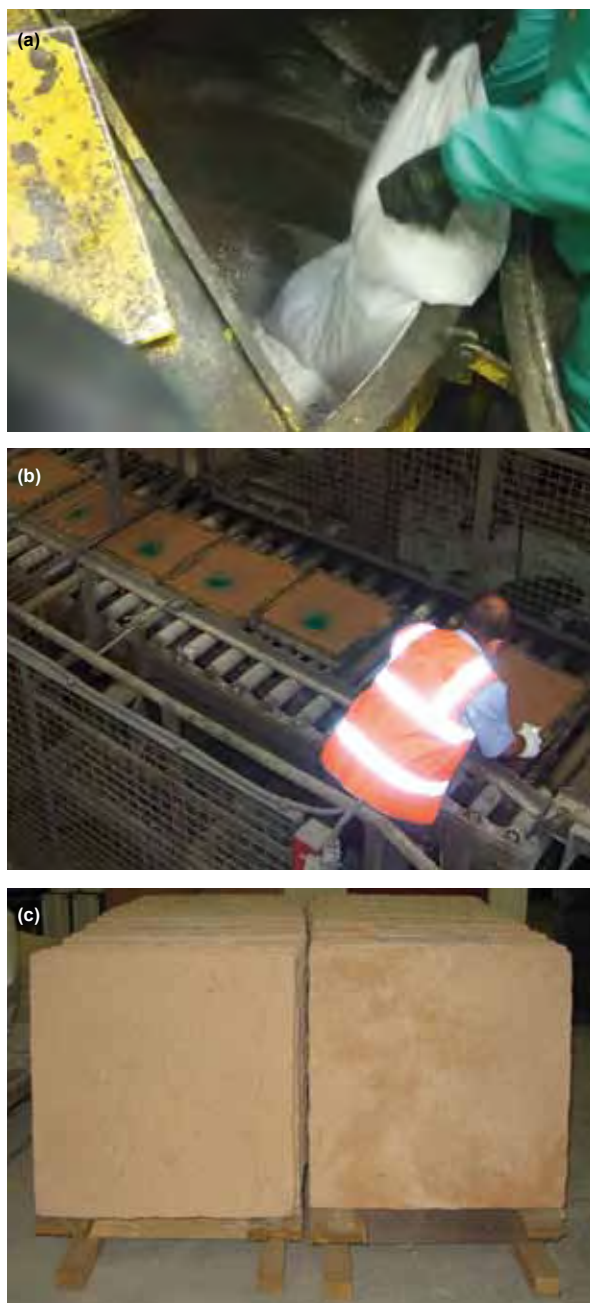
Precast concrete manufacture: (a) solid binder being added to concrete plant mixer, (b) concrete products compacted in mould on production line, (c) finished concrete paving slabs after demoulding
